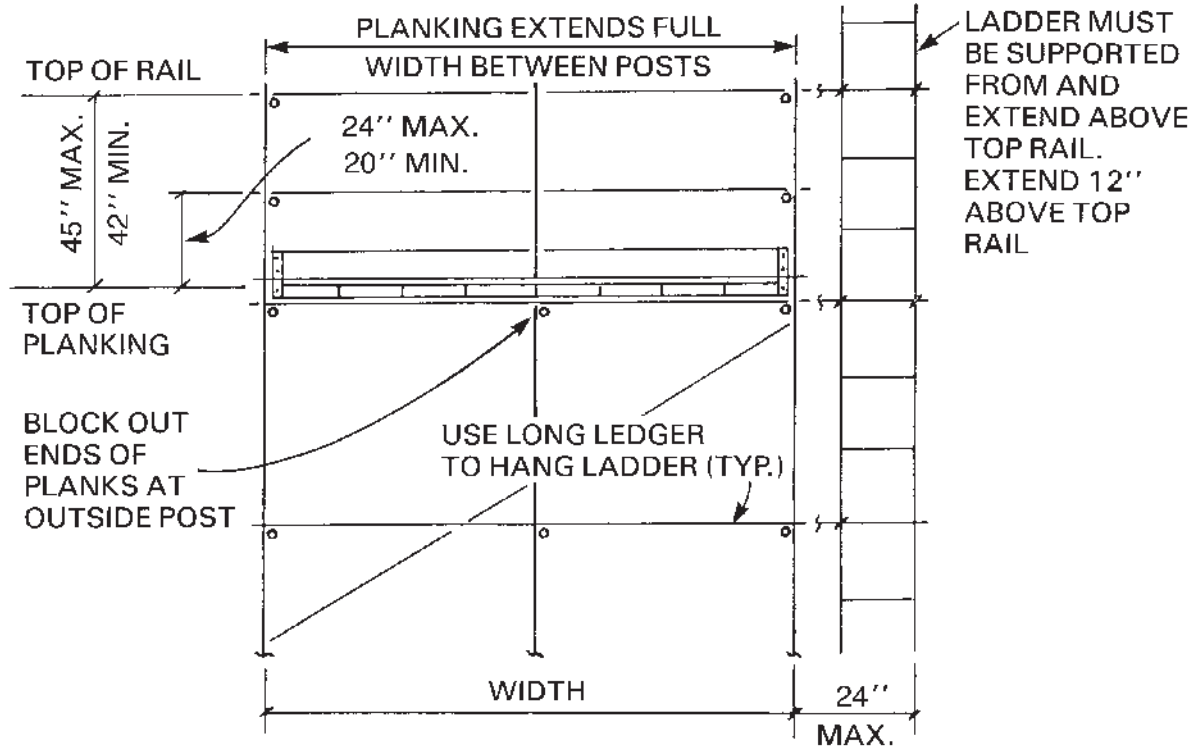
Typical Tubular Steel Diagonal Bracing
